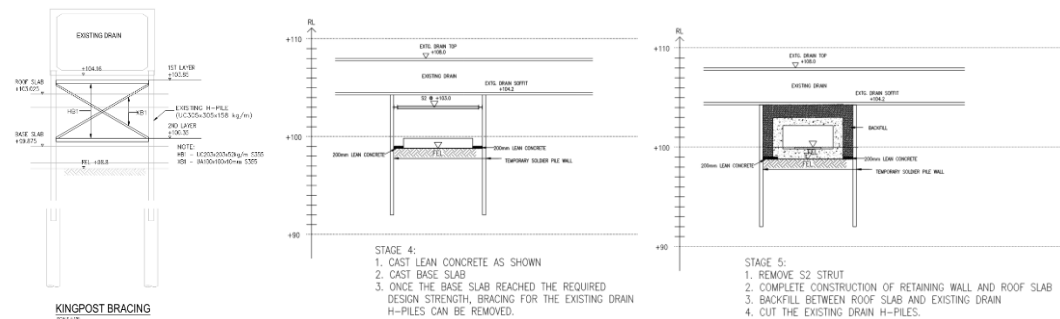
Strengthening localise area of drain existing H-pile to facilitate the construction of under-crossing CSS
